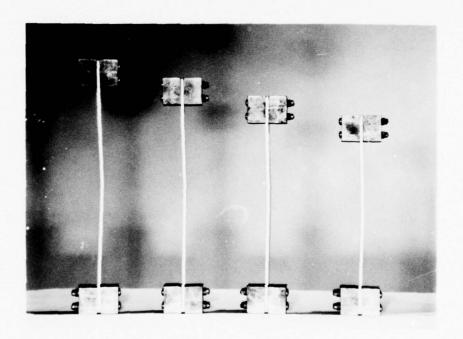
COLUMN TEST SPECIMENS AFTER FAILURE AT ROOM TEMPERATURE.
